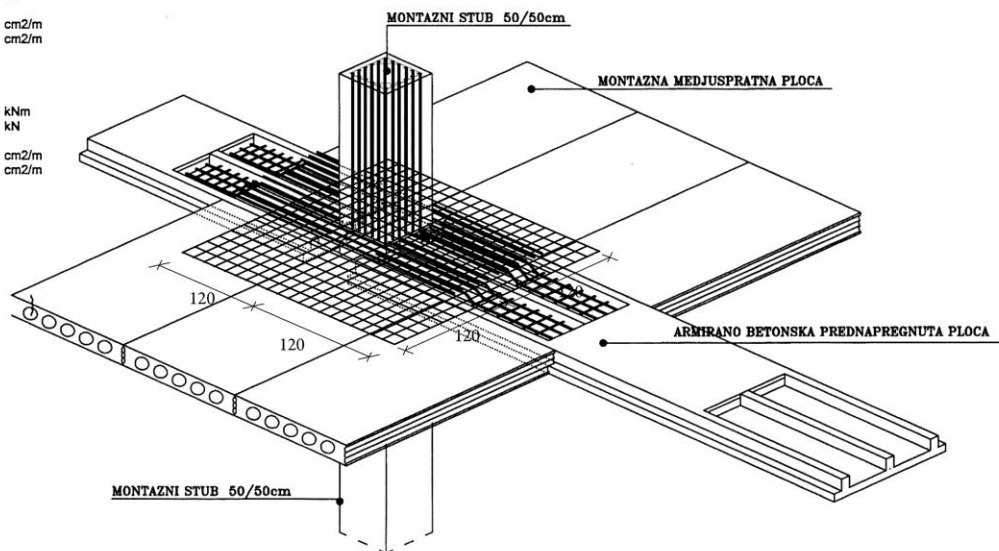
Tower programs for pillar. Connection between pillars and prestressed panel
